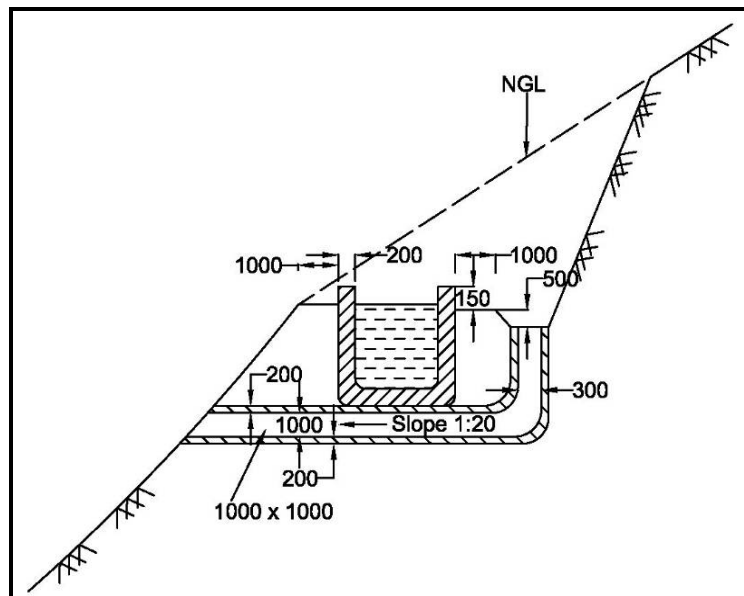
Cross Drainage work to Pass Hill Drain Water
